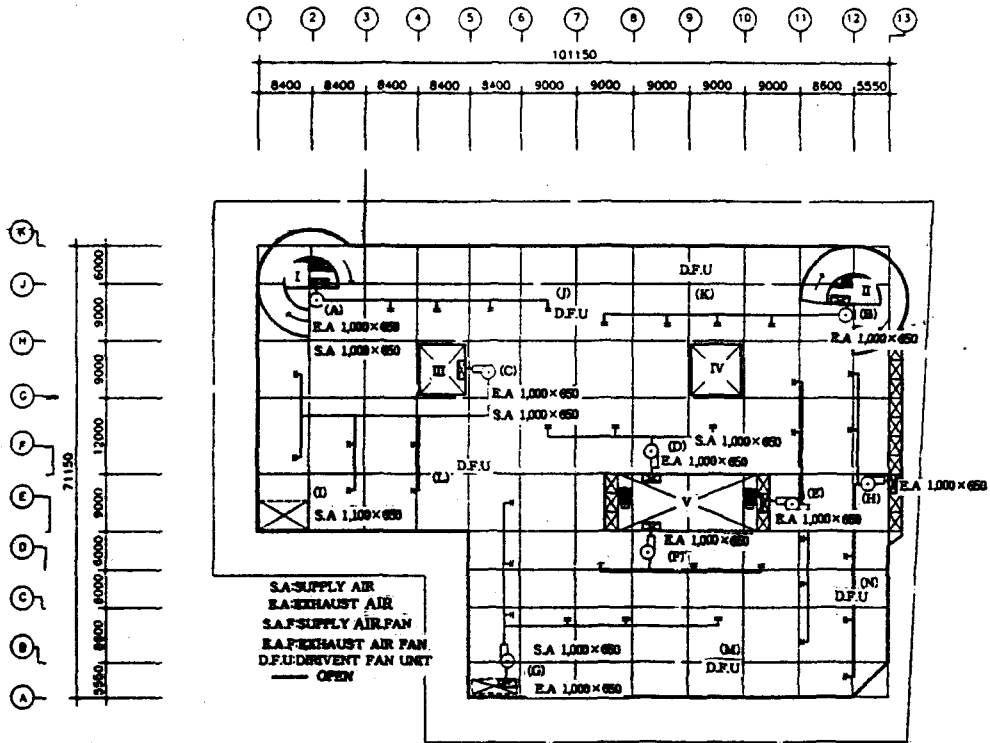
Story Plan Diagram for Air Ventilation Type Application
